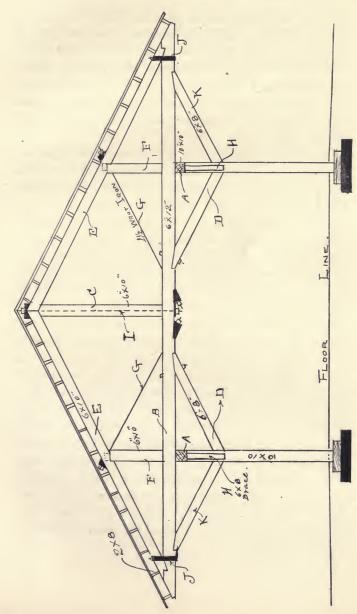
Design and Details of Cantilever Roof. Scale 1/8" - I Foot.
